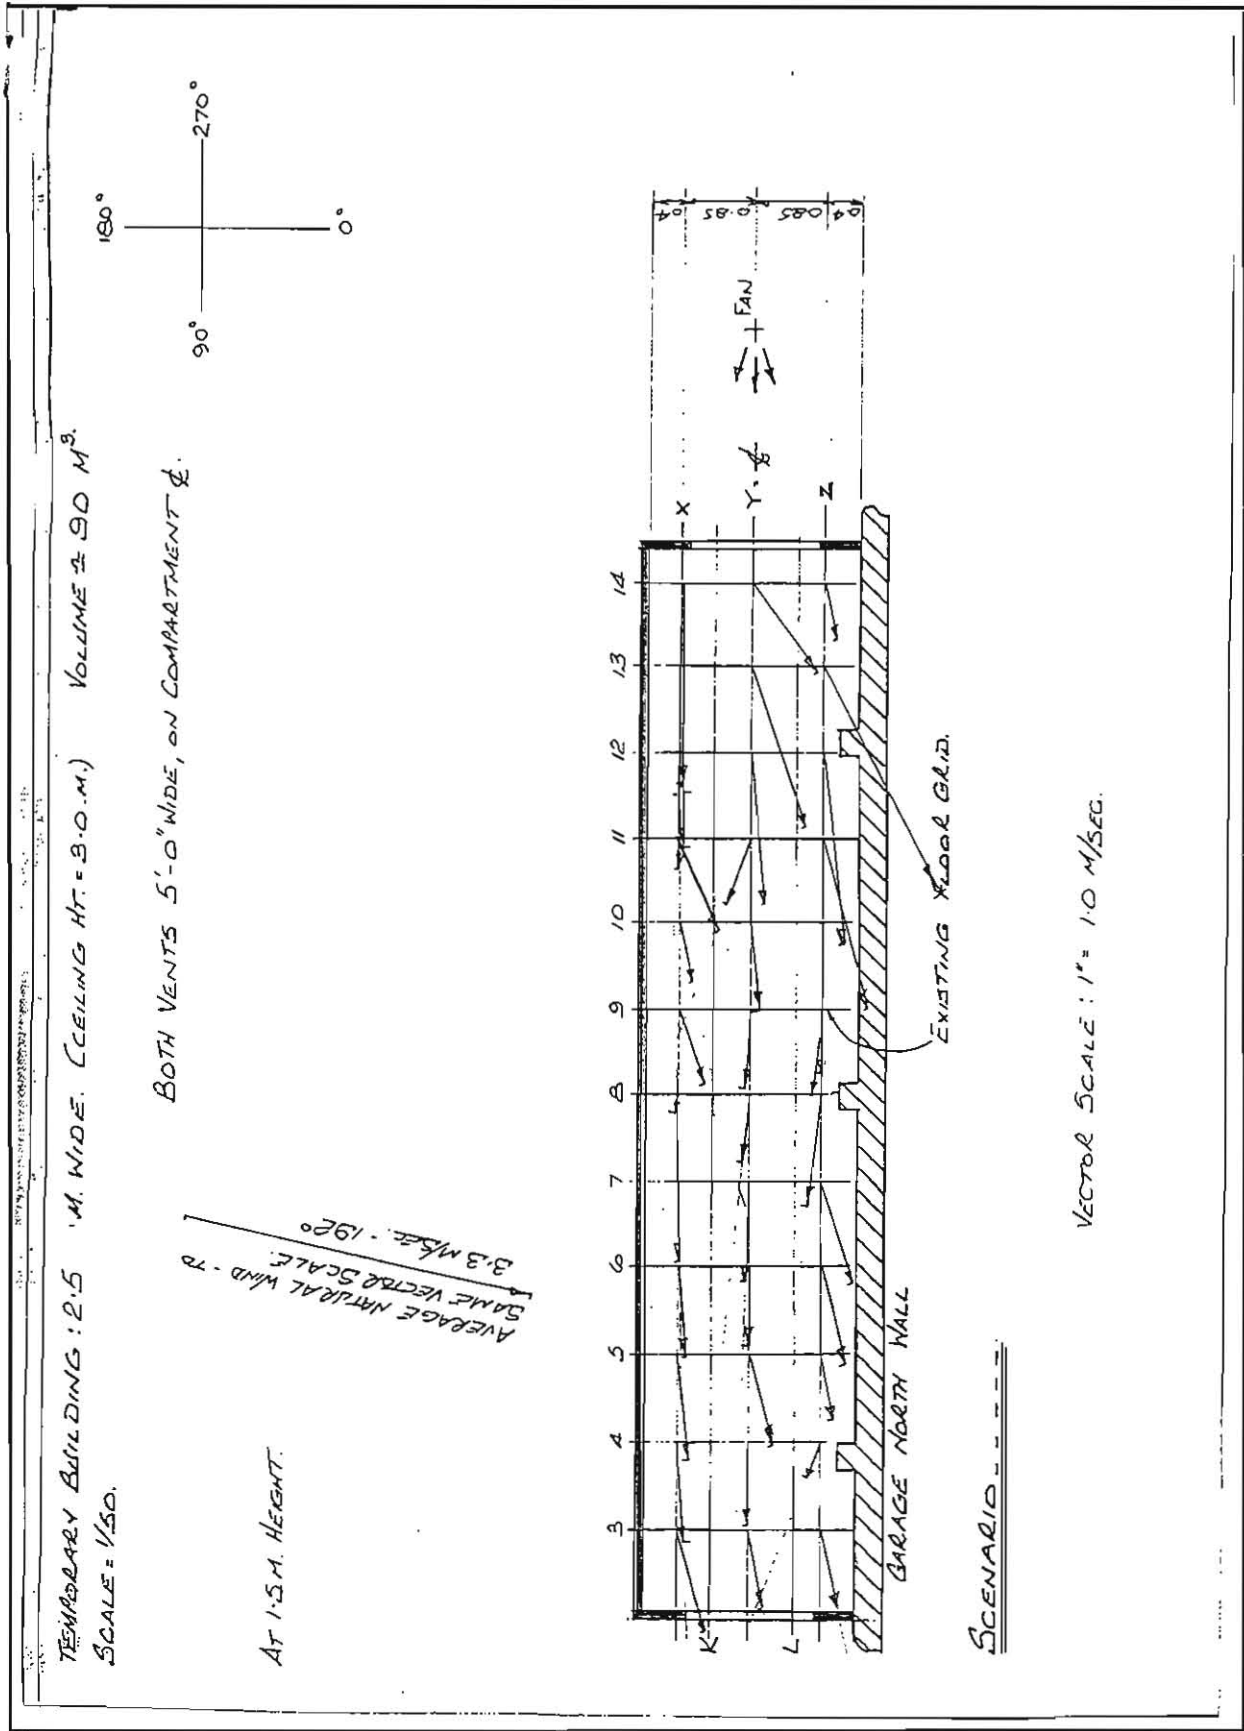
Airflow survey in 2.5 metres wide compartment: 5' 0" inlet 5' 0" outlet.
